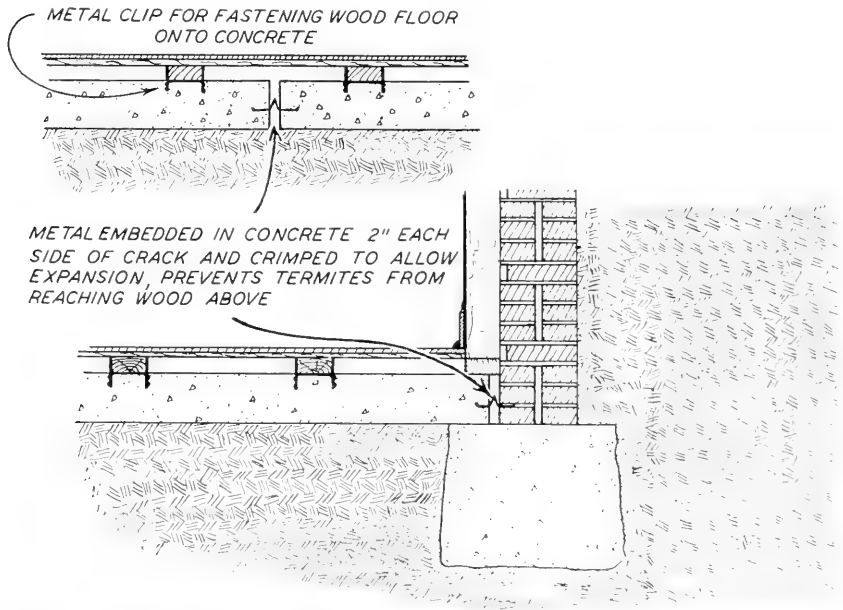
Metal expansion joints installed to prevent entry of termites in union between concrete floor and wall and between two sections of concrete floor. Many modern buildings are infested through these unprotected points. The sleepers are held by metal clips instead of being embedded in the concrete, as is usual. An alternative type of joint is shown in fig. 14.
